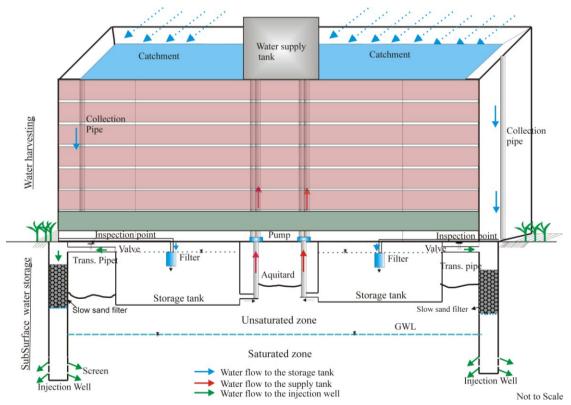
Schematic diagram for Rainwater Storage Supply and Recharge (RWSSR) for the civil engineering building at BUET
